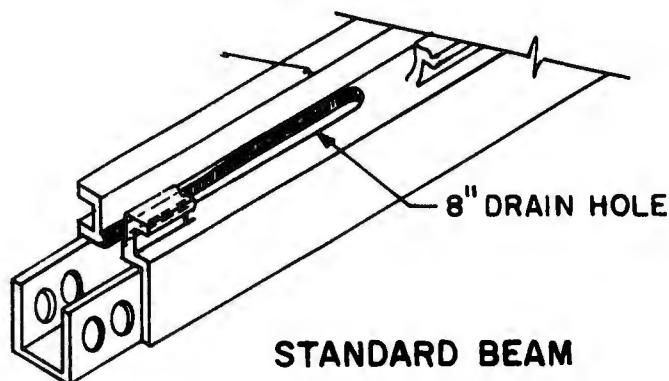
End of a Typical Arch Beam With Cutout For Water to Enter Beams
